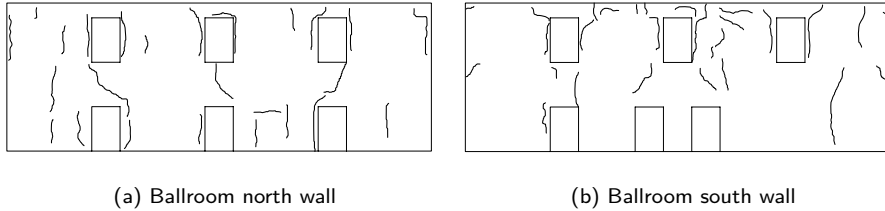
Monitored crack pattern, tunnel excavation completed, $V_L = 3.3\%$, upper floors (Frischmann et al., 1994).
